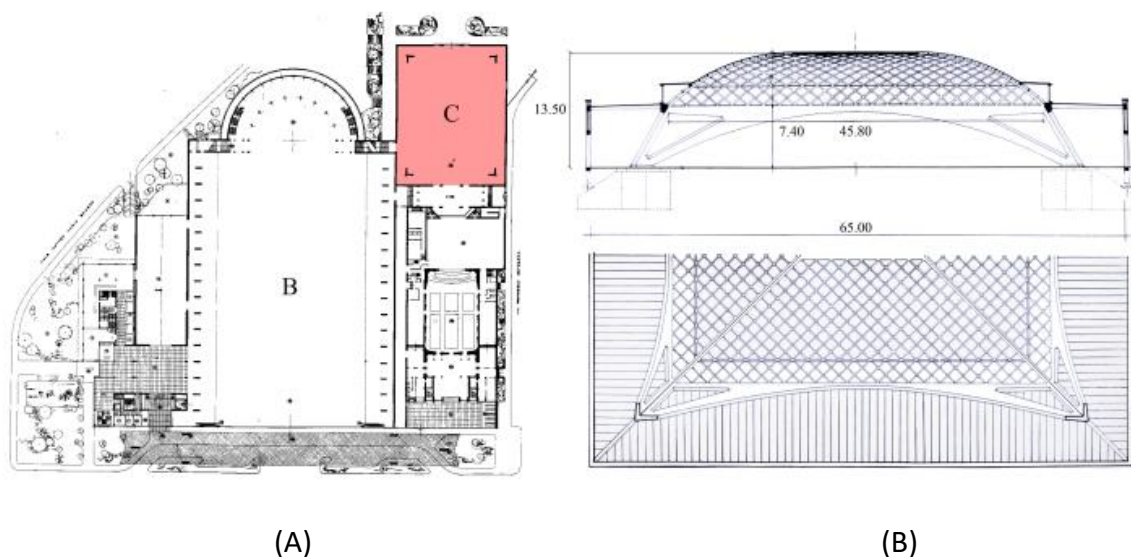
Plan of the Turin Exhibition: Hall B, the huge rectangular area in the; Hall C, the smaller rectangular shape in the upper right corner, was constructed a year later; (B) Pier Luigi Nervi's plan and section of Hall C from the (*Rassegna tecnica della Società degli ingegneri e architetti in Torino.*) [25]
